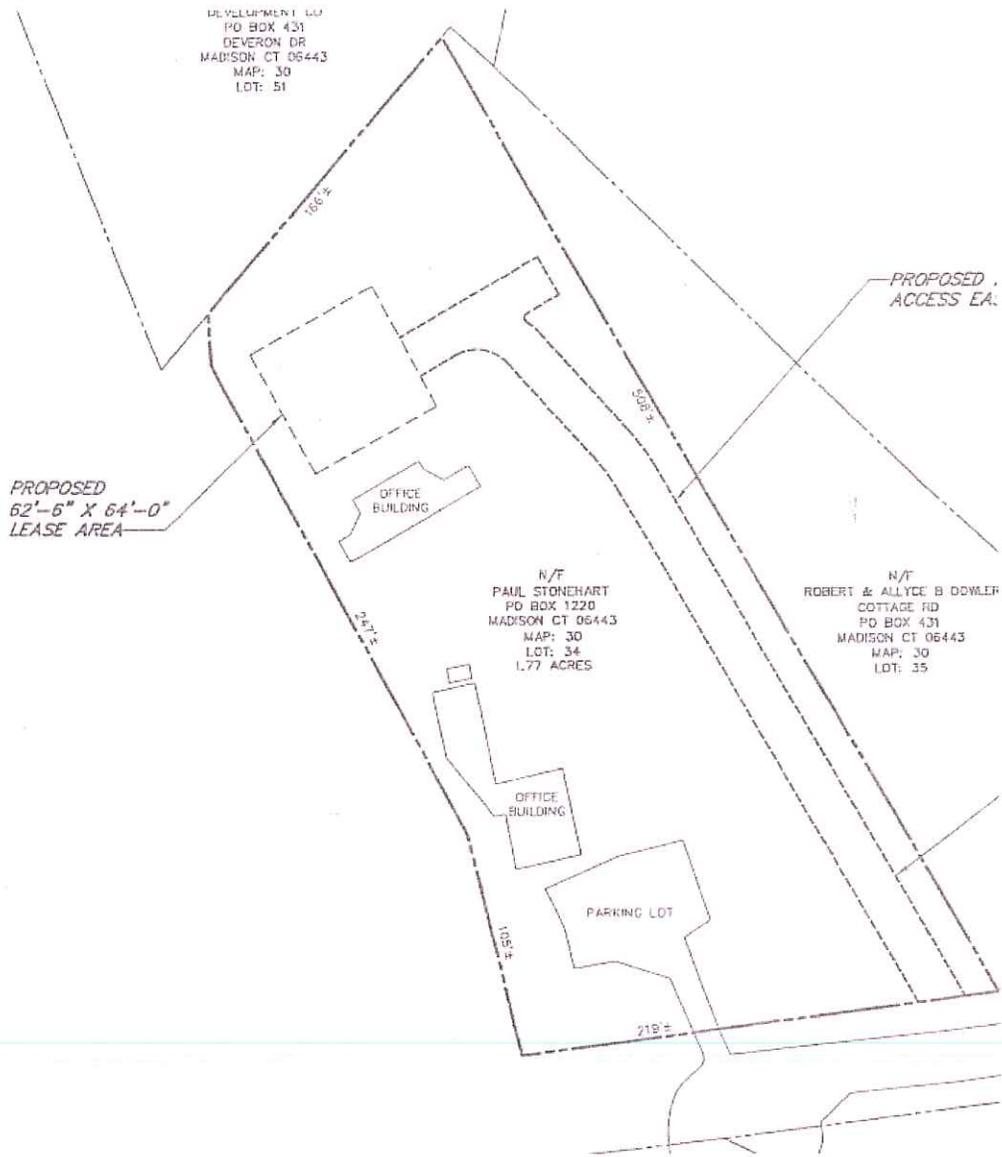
Site drawing showing proposed site on the host property. (Lighttower 1, Tab 5)
